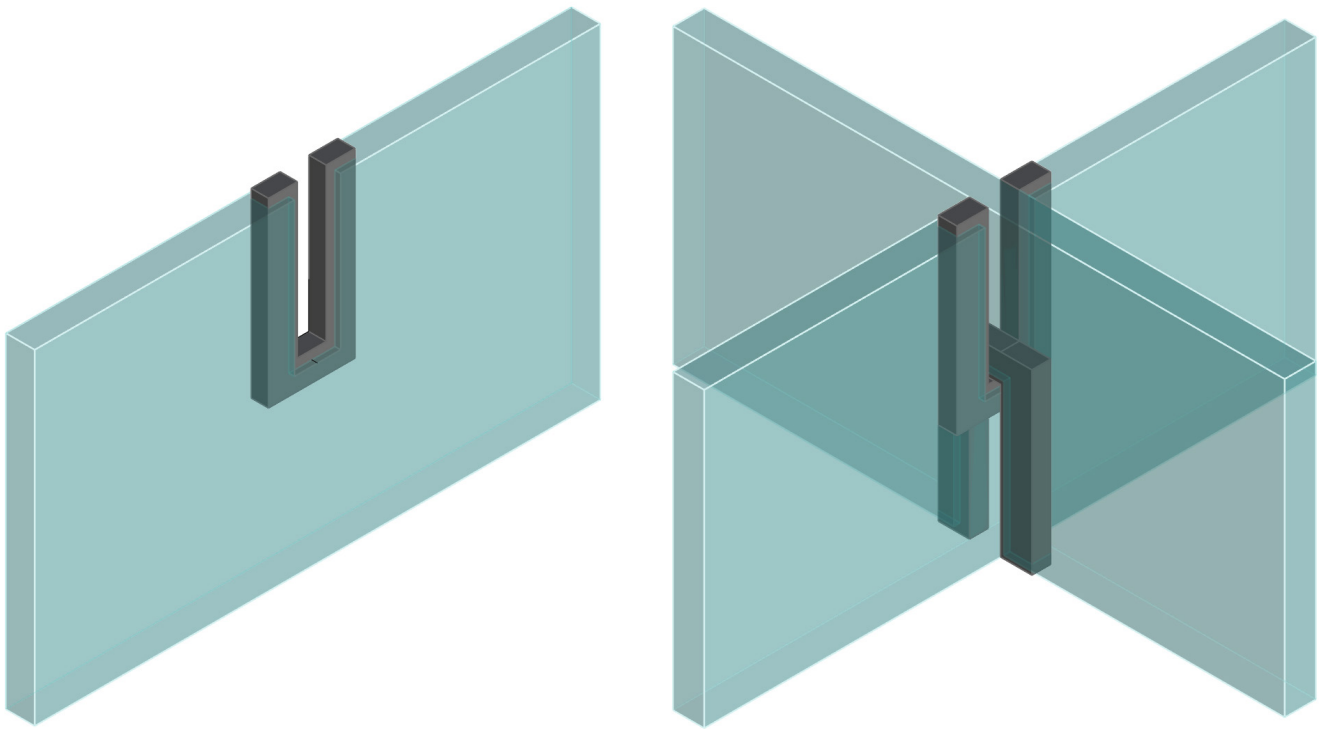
& 29, Slot joint connection design using embedded steel plate, Source: Author's own
